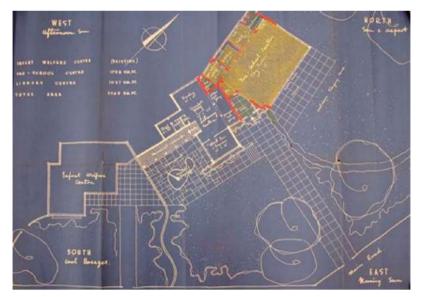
Sketch site plan c.1953, showing the spatial relationship of the Infant Welfare Centre, Children's Library and Pre-school. (Source: Public Building Plans File No.5841 Plan No.4057, Unit 413, VRPS 8044, PROV, cited in Mills and Westbrooke 2010:12)
